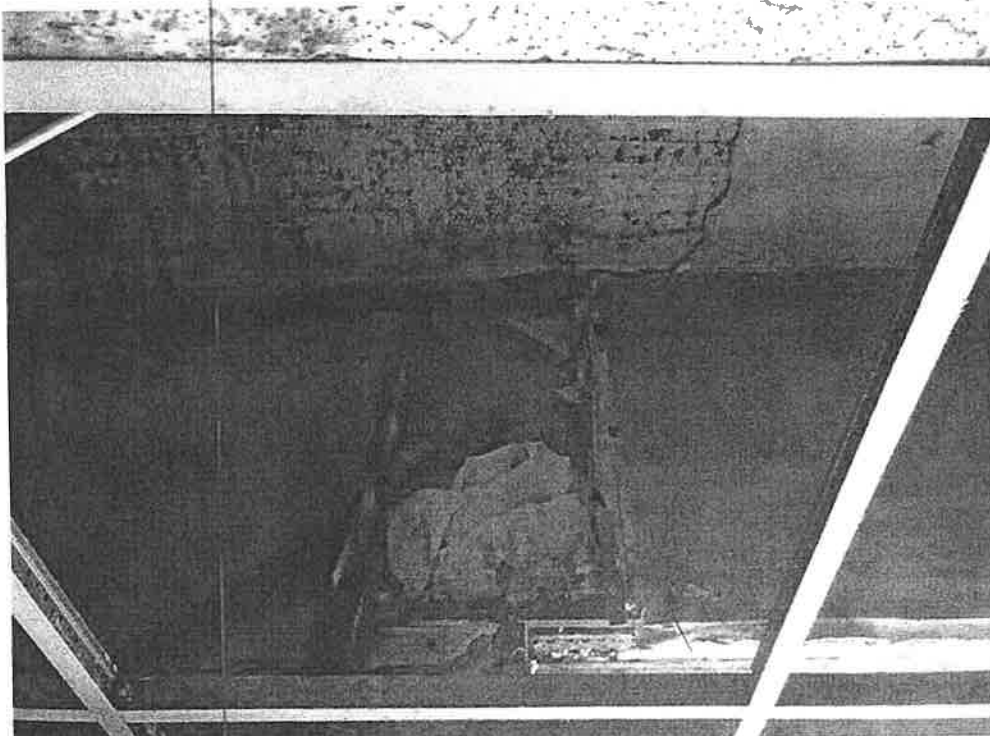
Moisture damage at lobby walls and ceiling. Note apparent mold growth.
